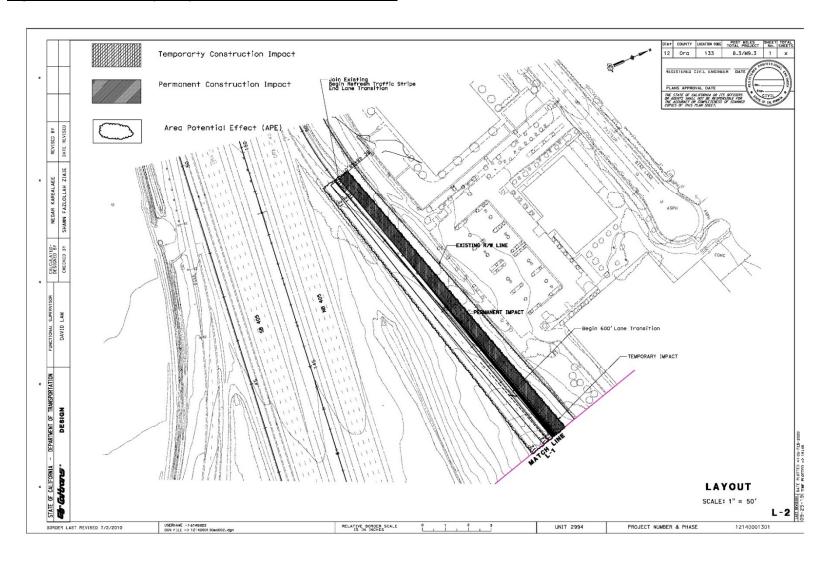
Preliminary Project Plan Sheets (Sheet 2 of 5)
